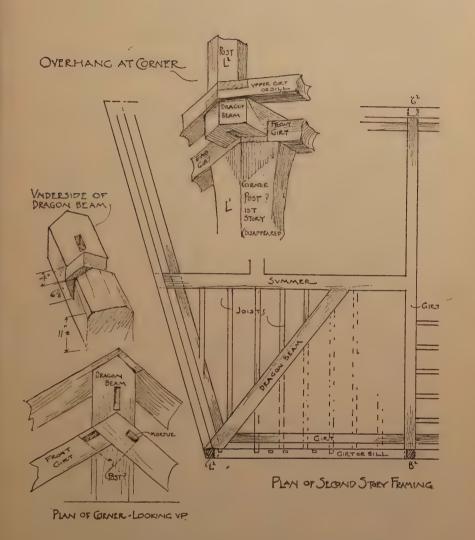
FRAMING DETAILS. THE OVERHANG
